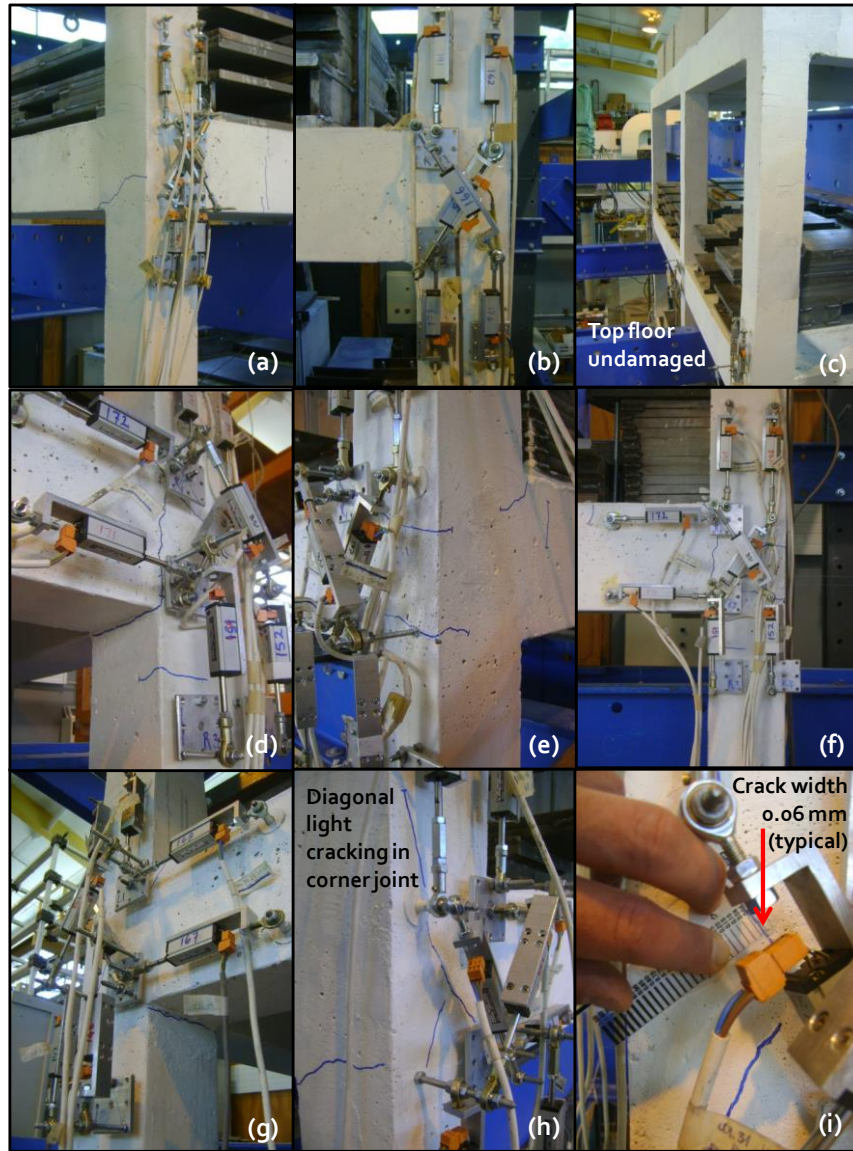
Damage in exterior beam column joints after series Test 2.1 – Darfield earthquake.
